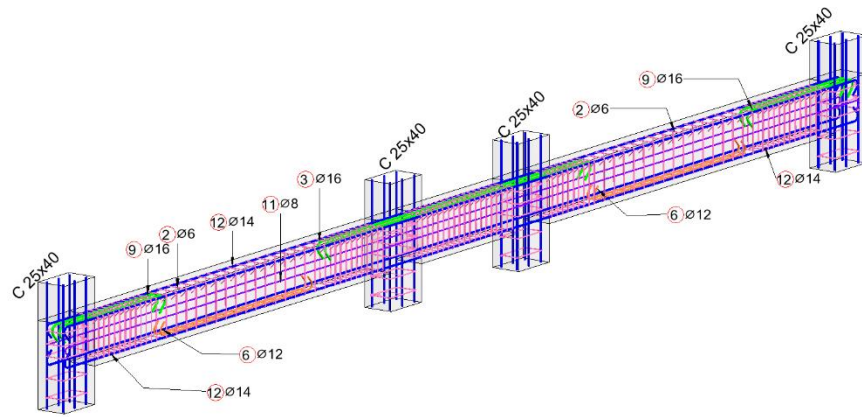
3D steel reinforcement view for the beam on axis 8
